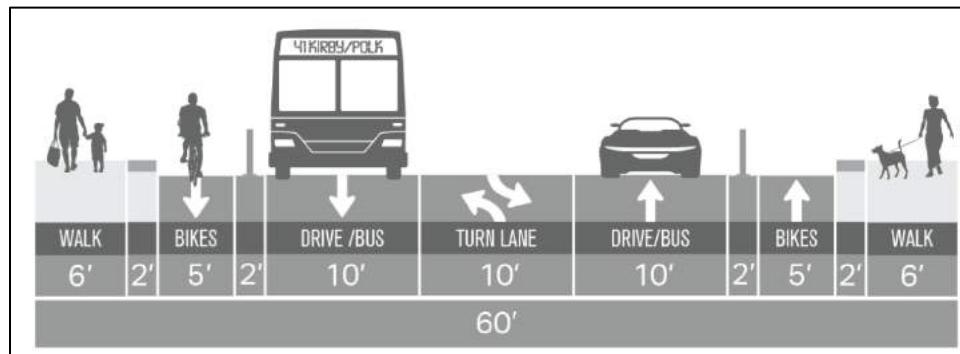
Proposed Typical Section of W Dallas Street from Waugh Drive to Montrose Boulevard
